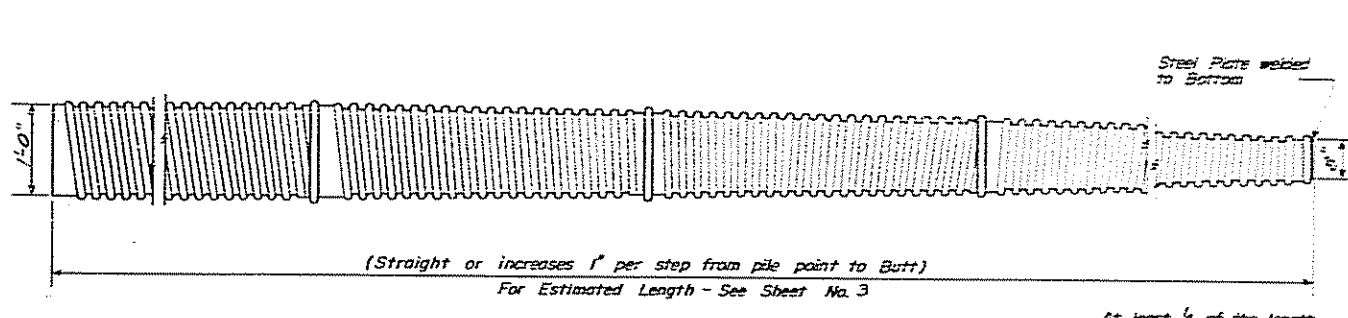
DETAIL OF TAPERED METAL SHELL FOR CAST IN PLACE CONCRETE PILES
